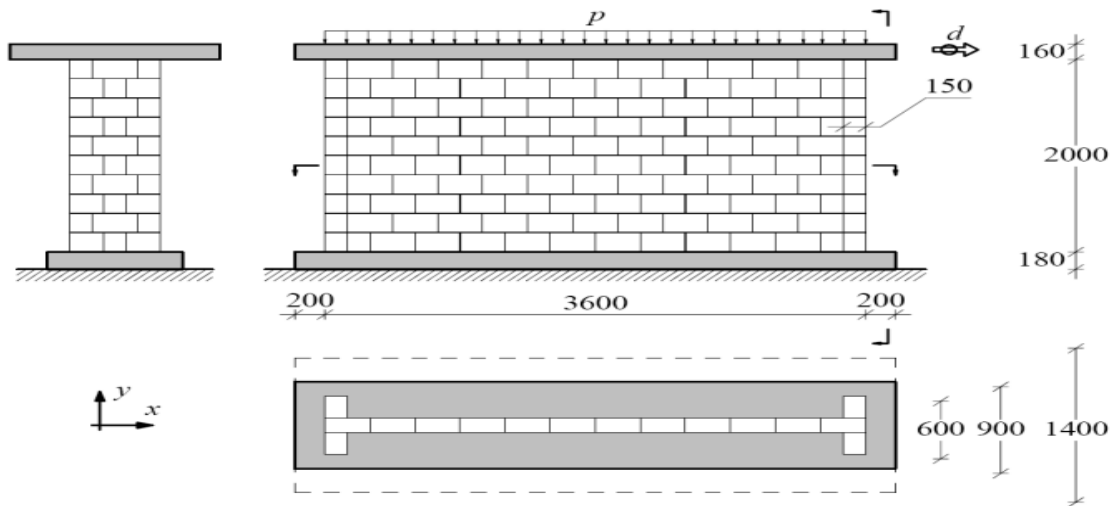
The Dimensions of Wall tested in ETH Zurich (All dimensions are in mm and $p=0.61 \text{ N/mm}^2$)
